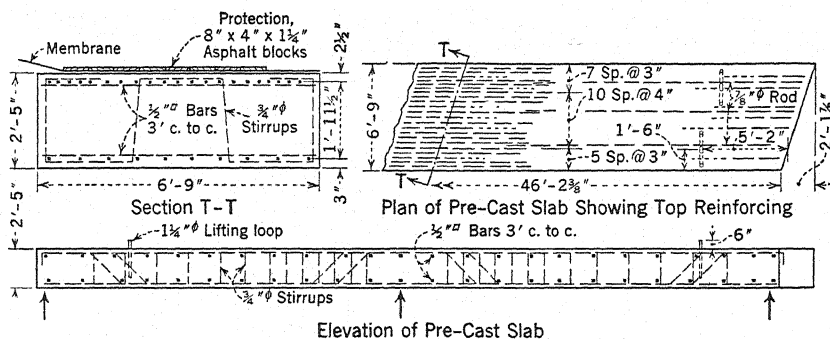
Continuous Slab at Montville, New Jersey. D. L. & W. R. R. (See p. 41.)
